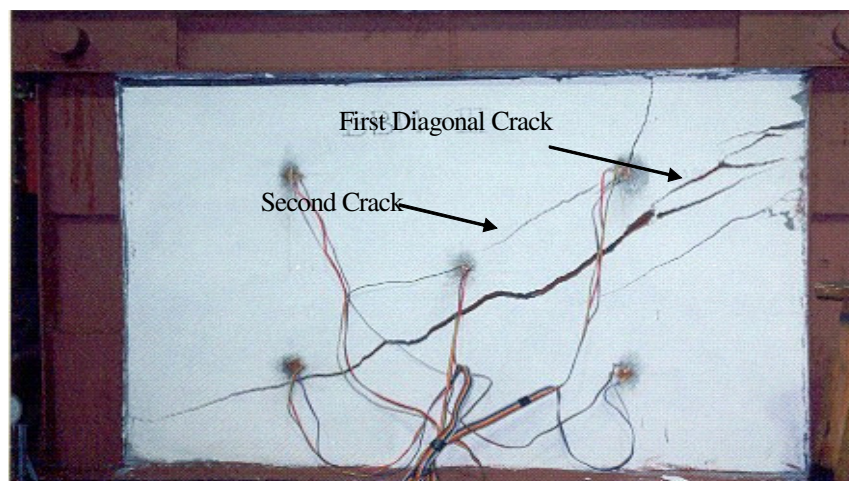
Failure Mode of Infill Wall with Air Gap under.
